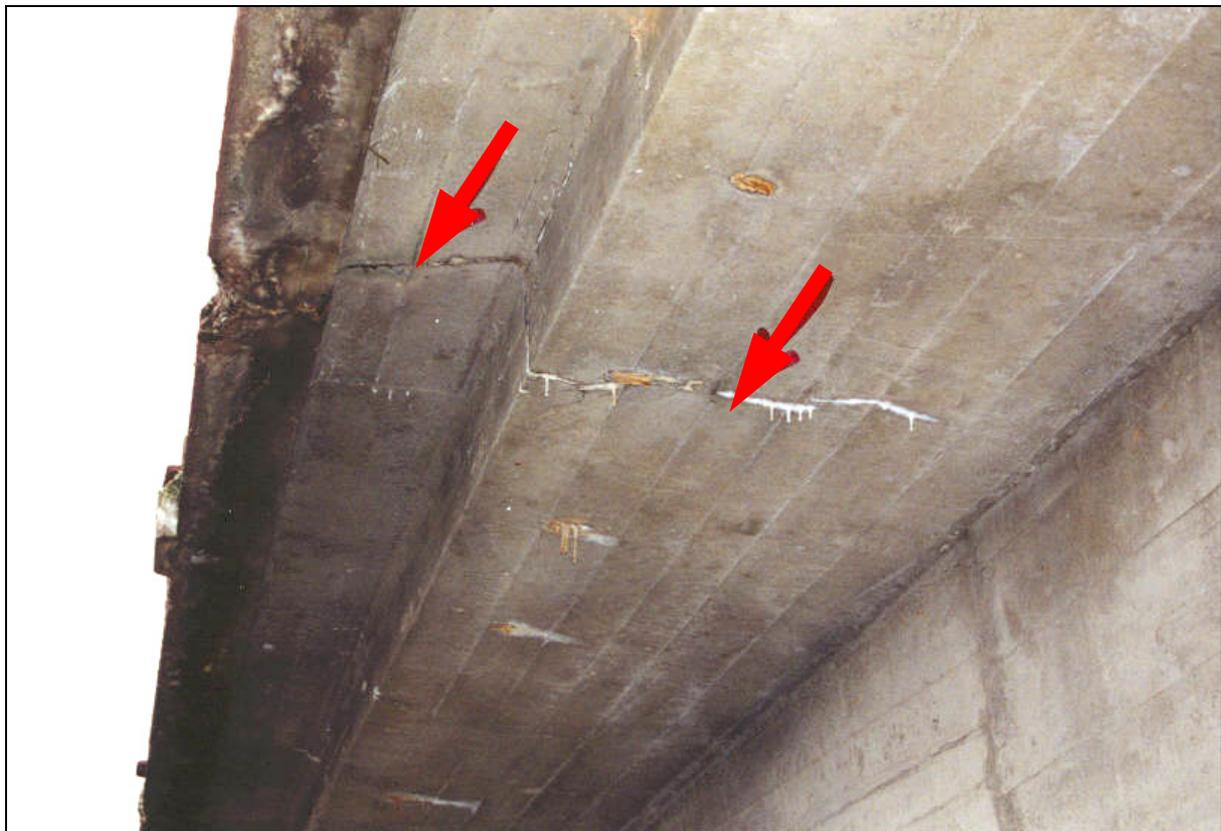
Cracking in the top flange of the girders above the intermediate support piers
